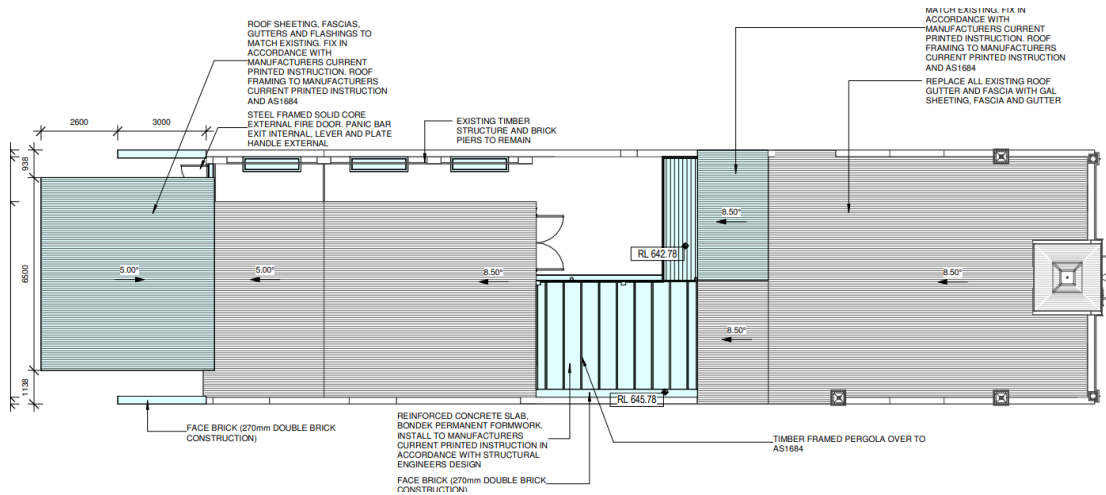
11 Montague Street proposed development overall roof plan (Source: TLA)
